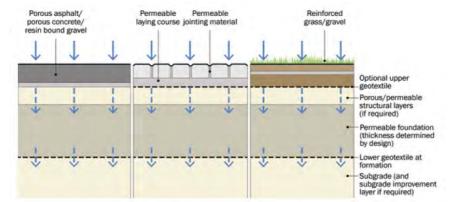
CIRIA C753 Figure 20.12 – Pervious pavement system types: Type A – total infiltration
